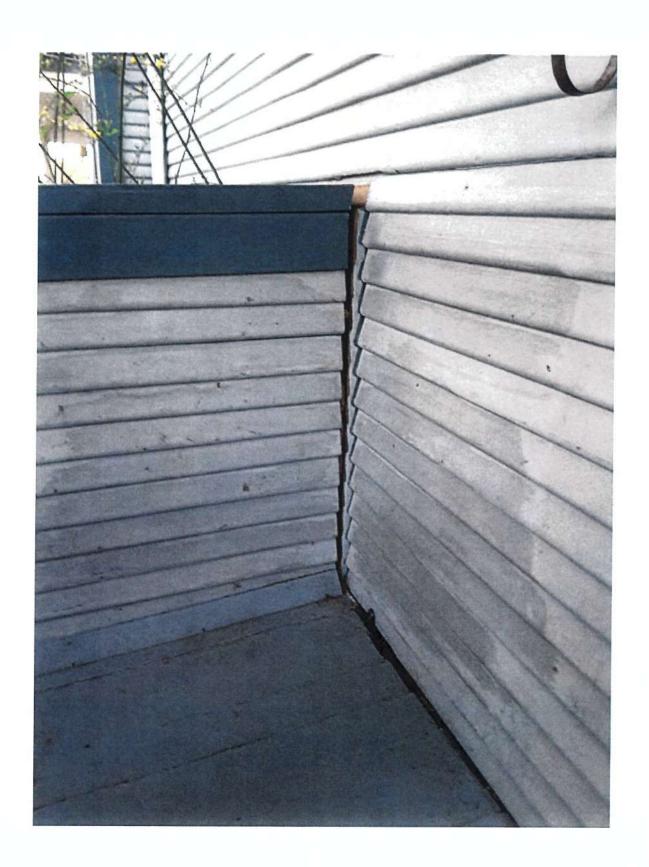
front porch and entrance basement stair gaps from soil settlement
